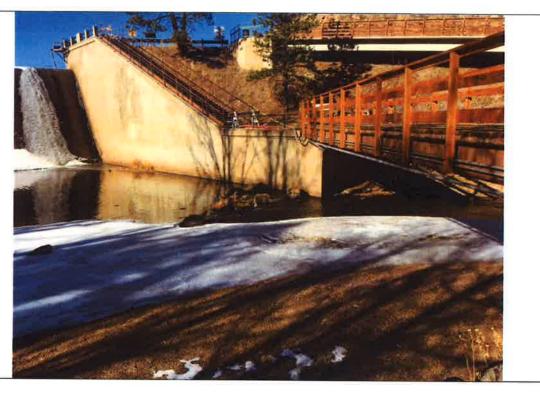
Left abutment and pedestrian bridge. Notice sediment at crest of outfall pipe.
